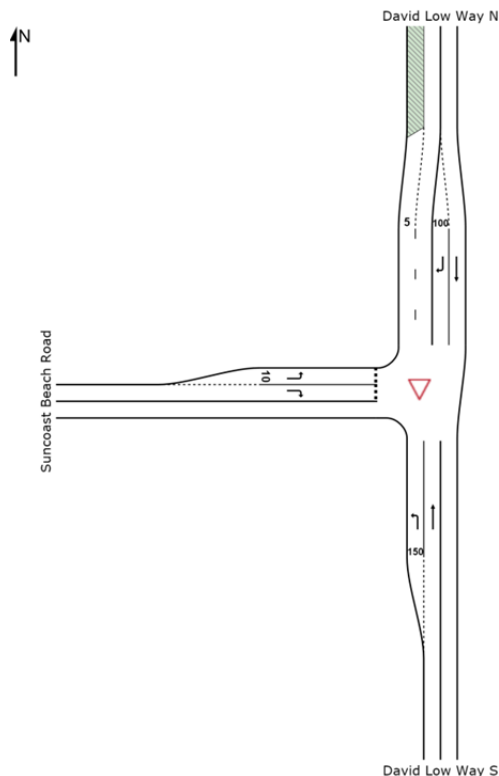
Suncoast Beach Road / David Low Way Intersection Layout
